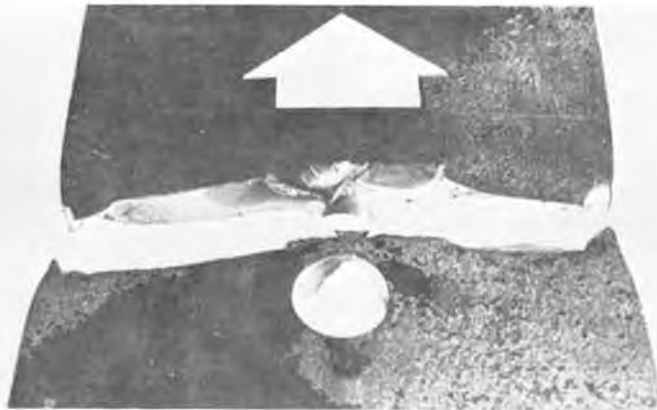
Fatigue crack growth in gross section of bolted joint.
